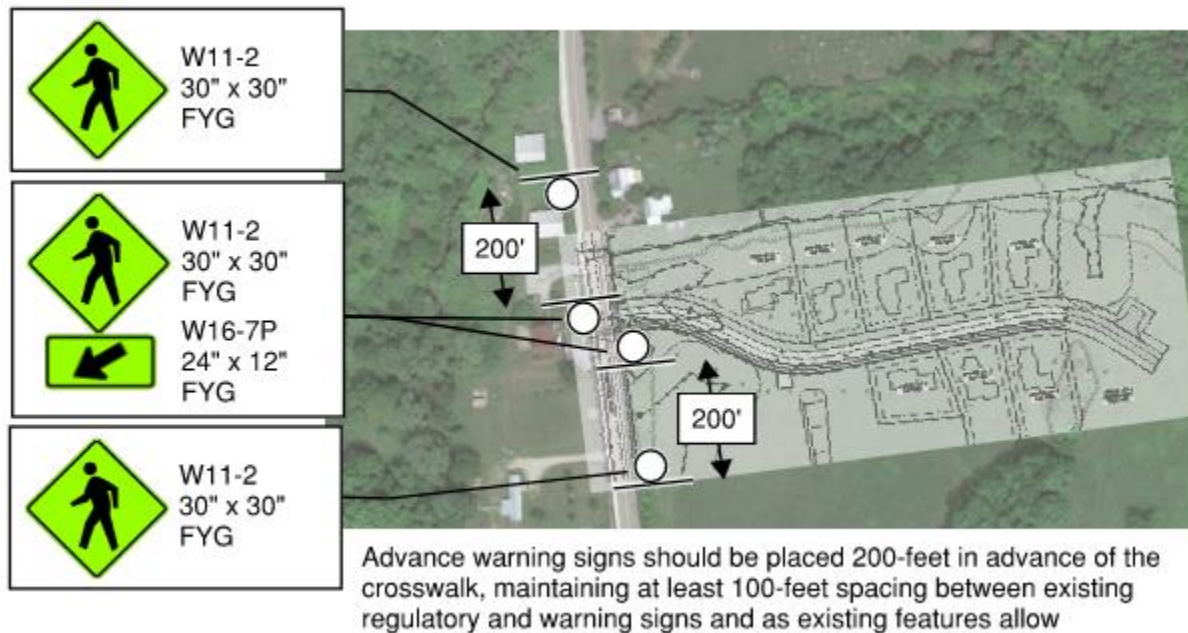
RECOMENDED SIGN PLACEMENT FOR CROSSWALK INSTALLATION
